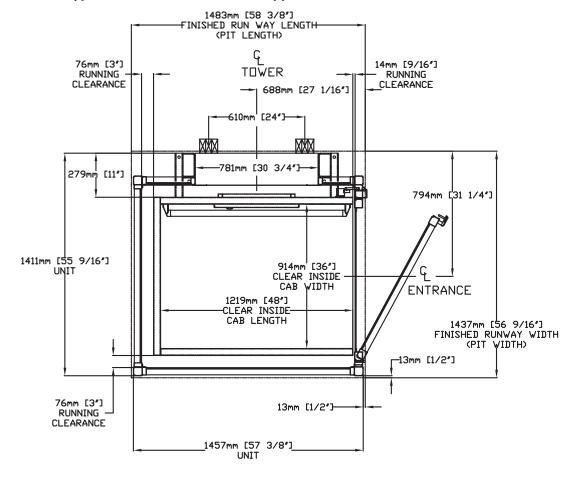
Plan View - Type 1R, 36" x 54" Cab, Hoistway Application
